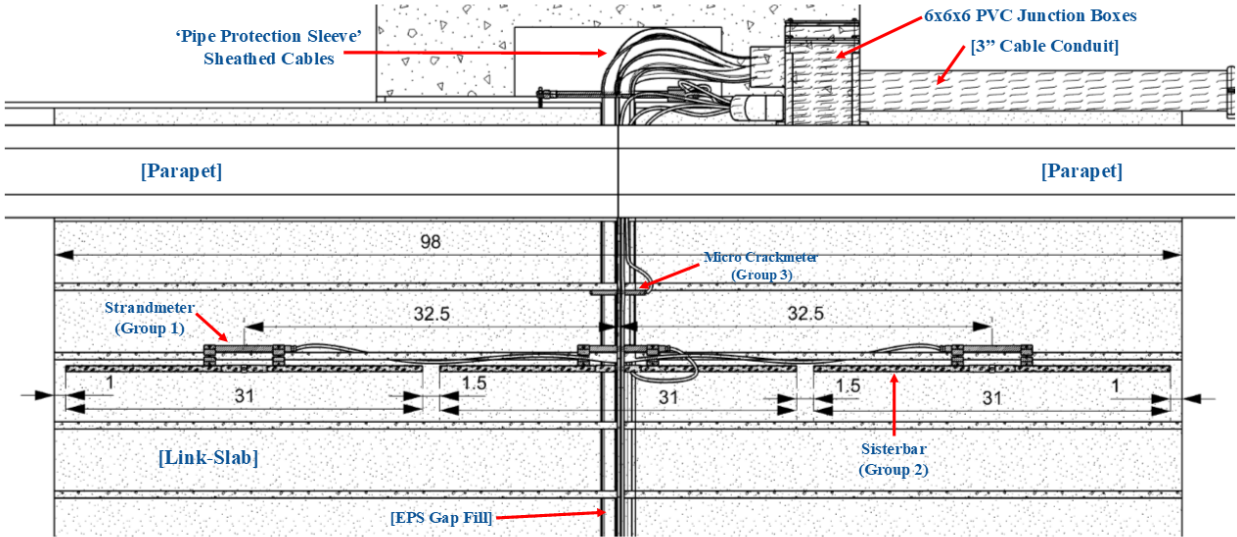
Drawing, Top View Detail of Link-Slab (Southwest Side)
